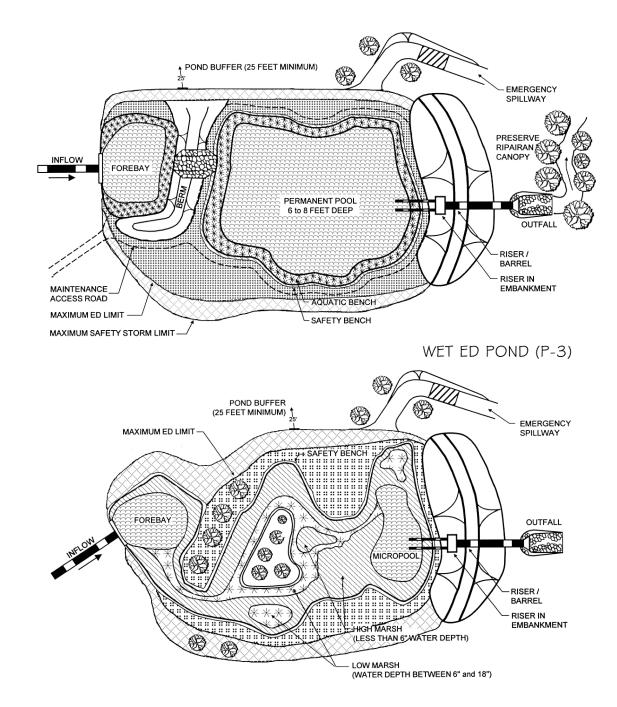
Hydrologic Zones Around Stormwater Facilities
